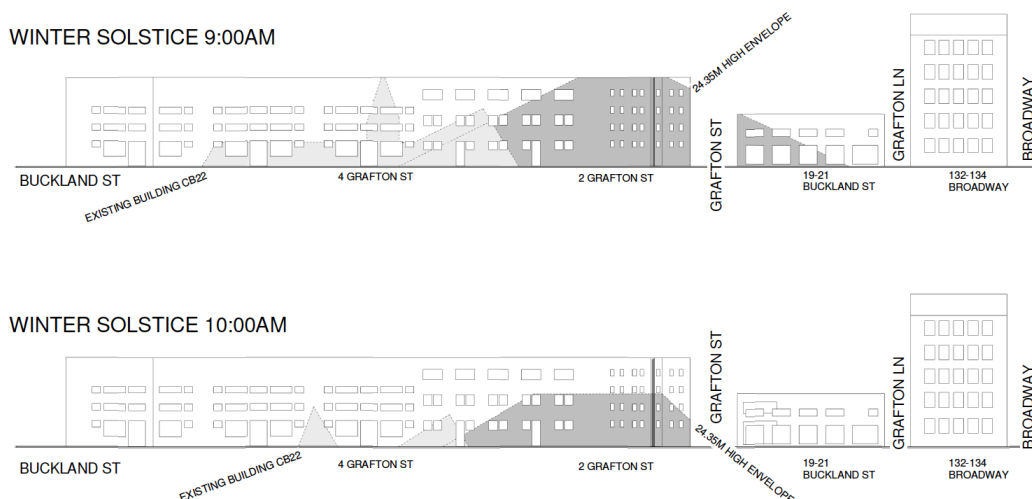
Winter solstice 4 Grafton Street – Elevation shadow study – extract from Drawing A5.08
